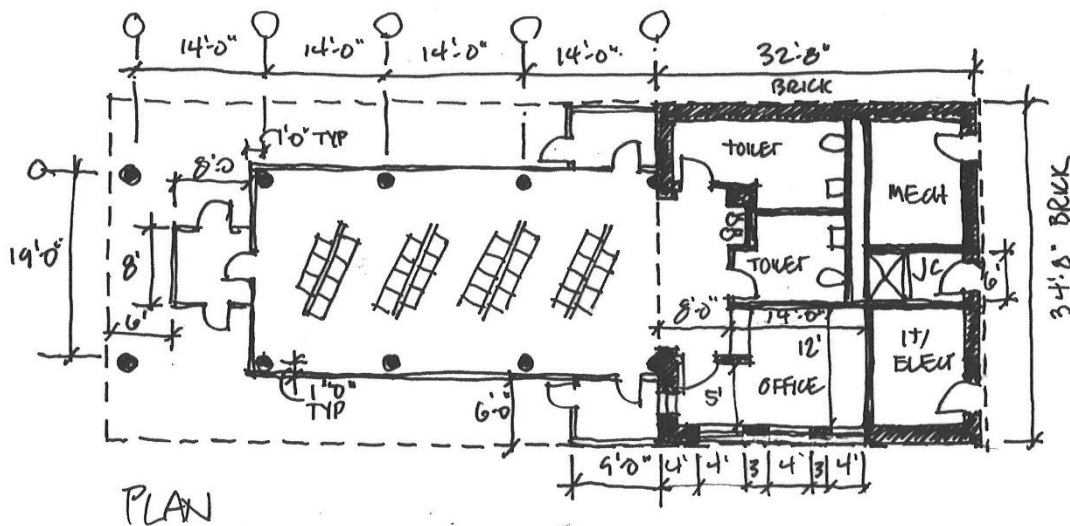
Transit Center Floor Plan – BMC Annapolis Transit Center
